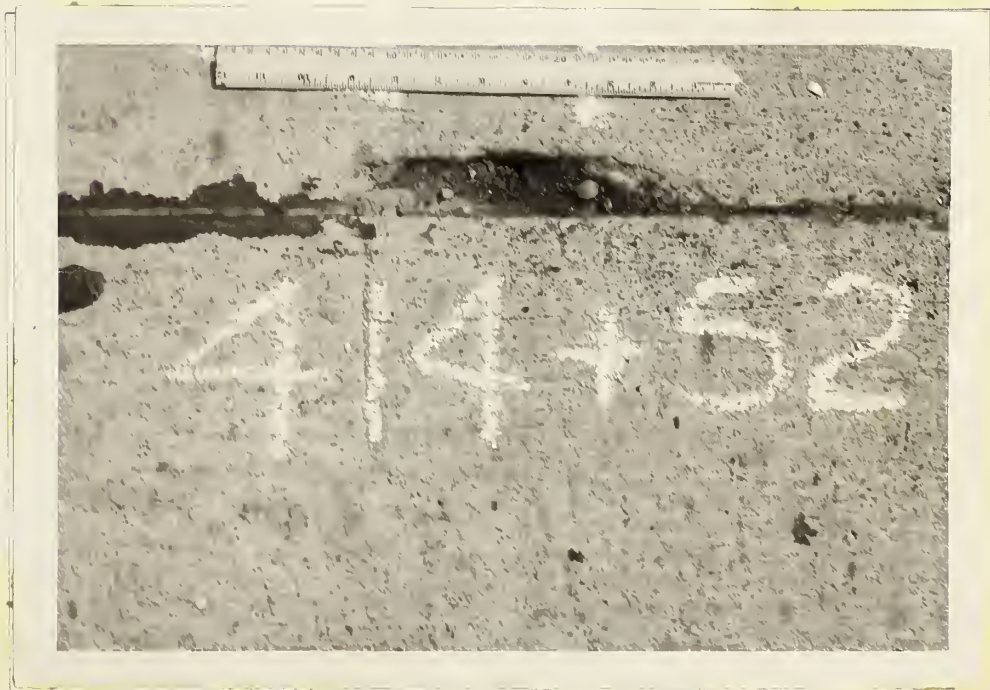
LOSS OF CONCRETE BETWEEN UNCONTROLLED
